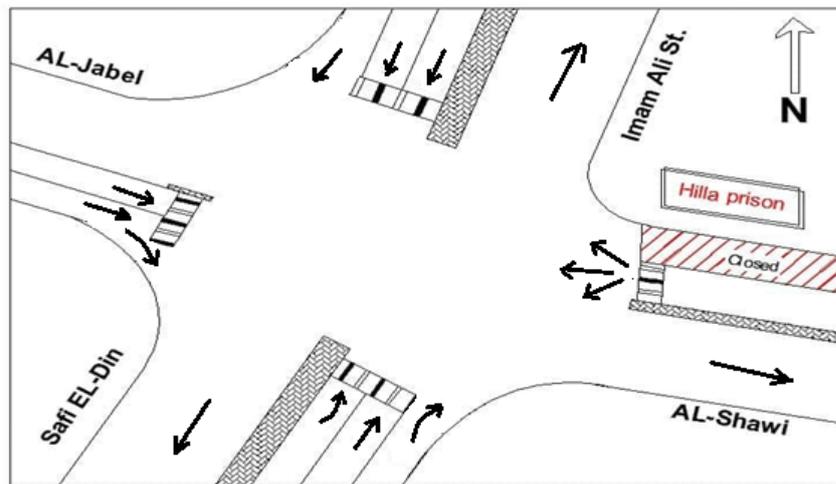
Geometric Layout of Bab-AL-Mashhad Intersection
